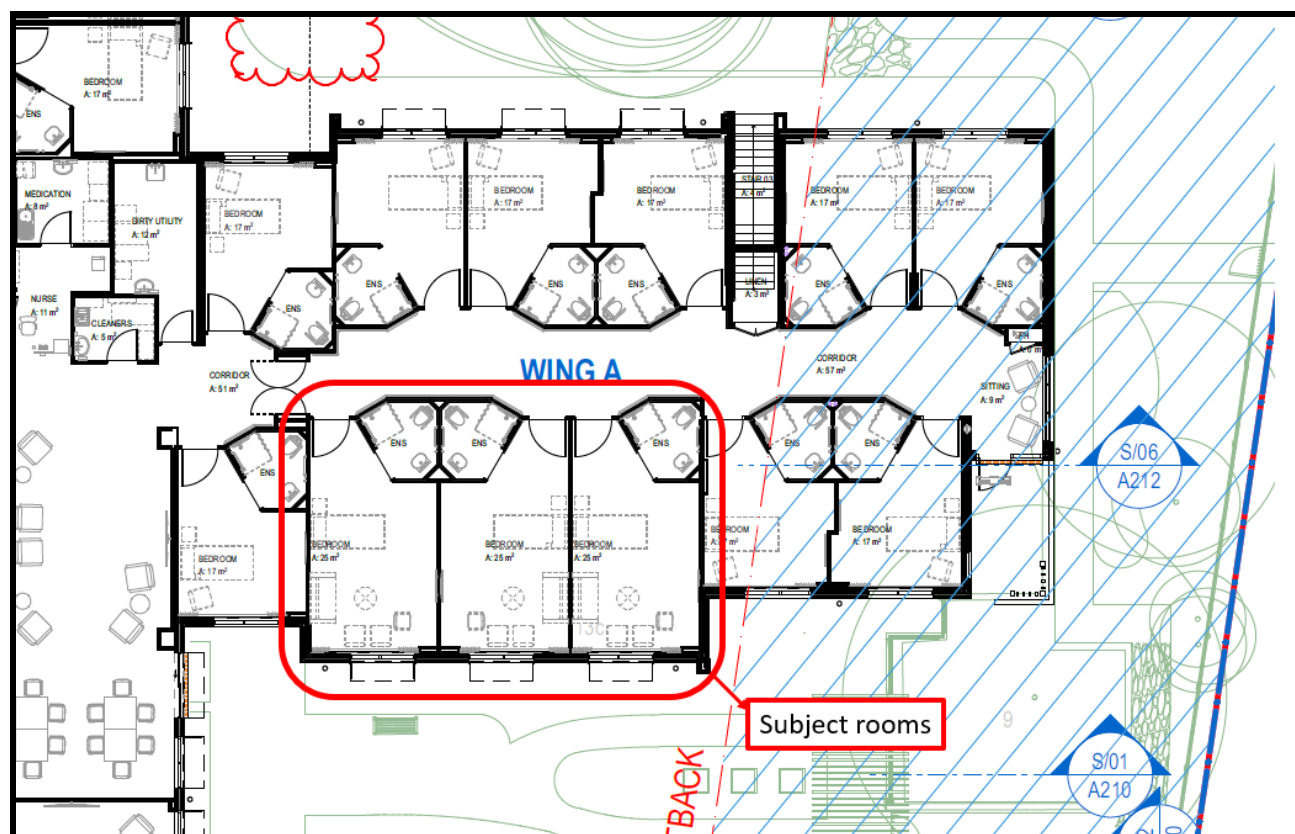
Existing lower ground floor plan (Source: Calder Flower)
